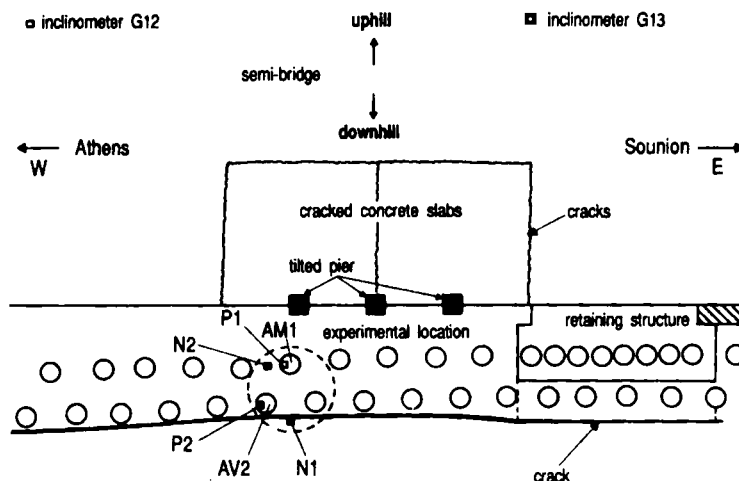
Plan view of the location of the stabilizing piles and instrumented piles¹⁸
